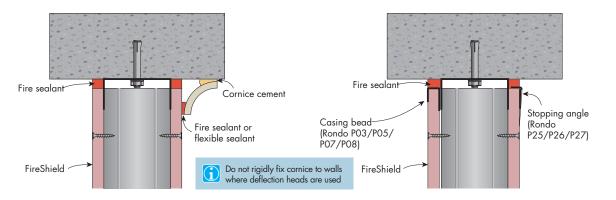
Wall Head to Suspended Ceiling Finishing Detail
